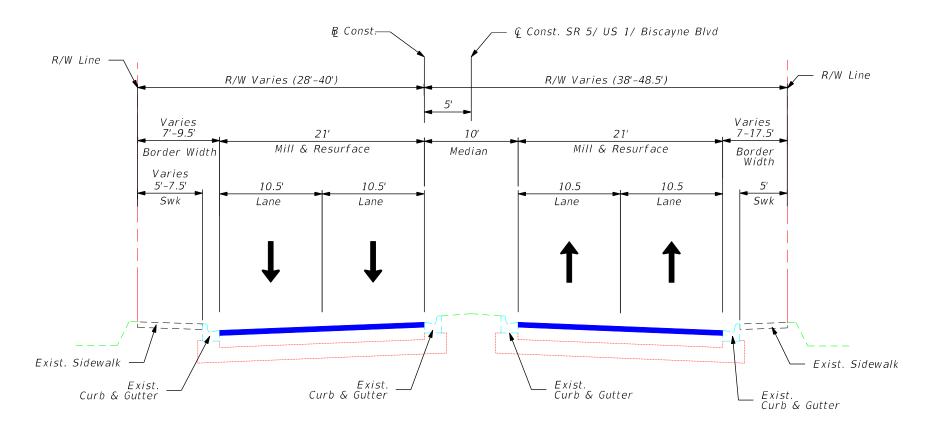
Recommended Typical Section from NE 88th Street to NE 90th Street
